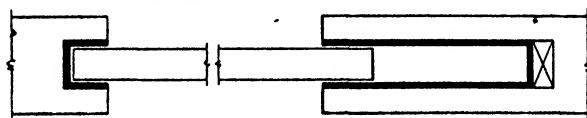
TRAP SEAL TO TRAILING EDGE OF SLIDING DOOR
